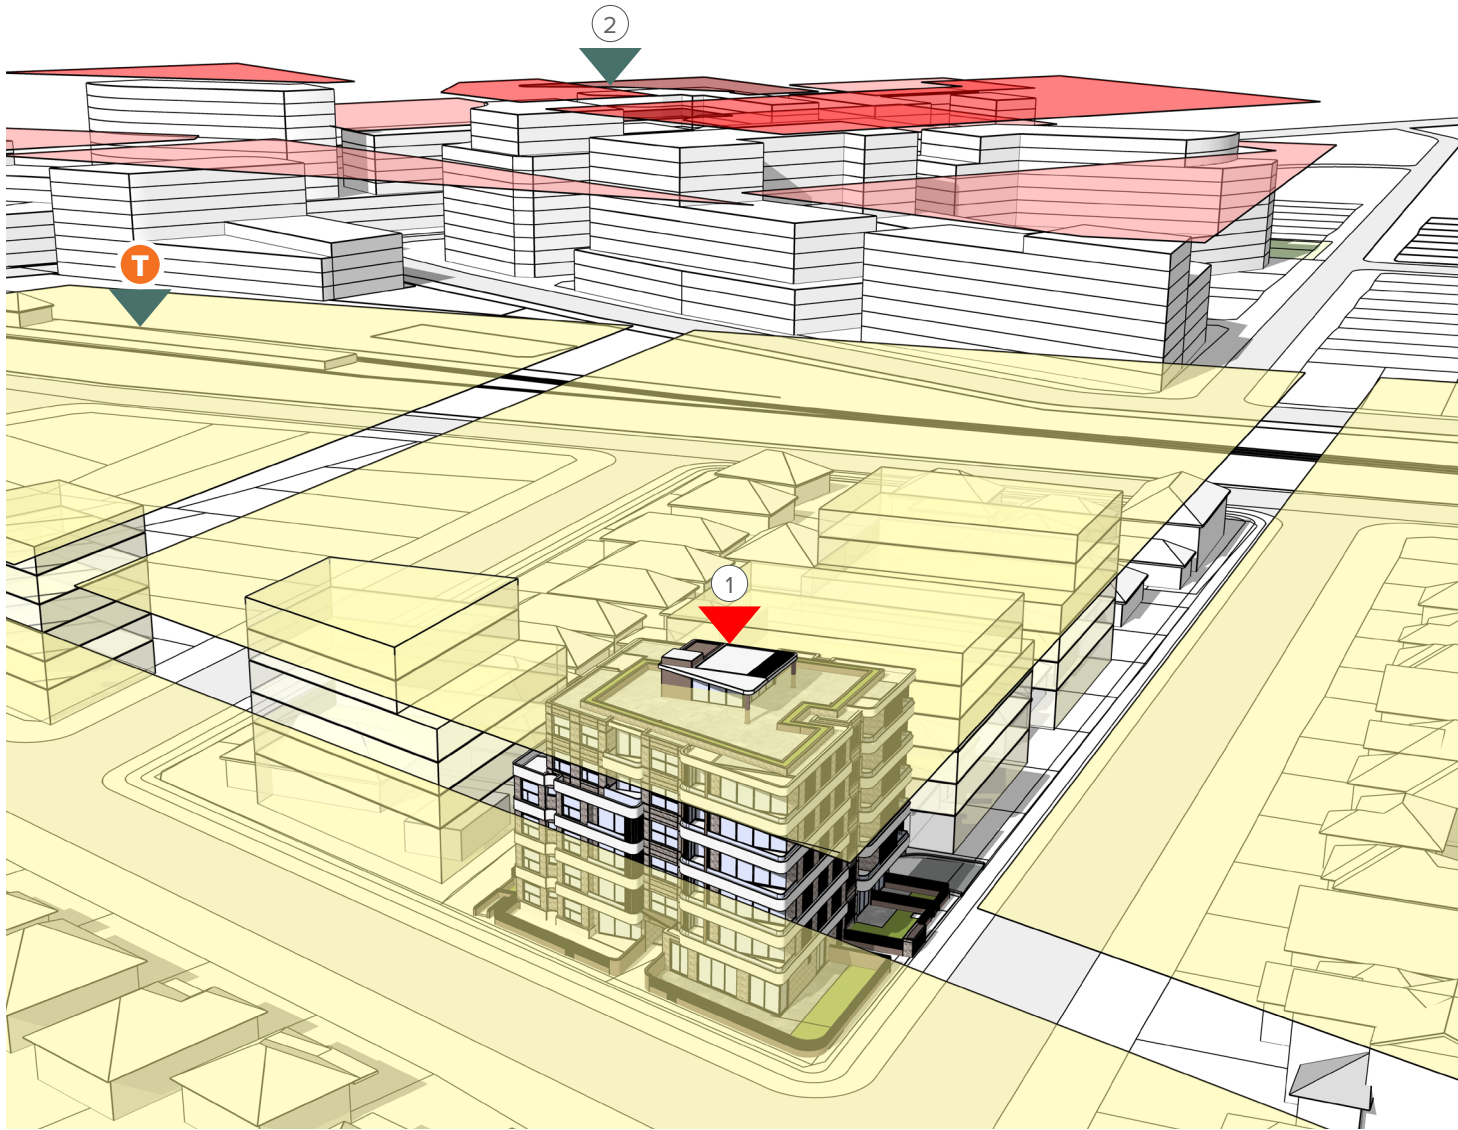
Proposed Future Massing with Height of Building (HoB) Overlay
